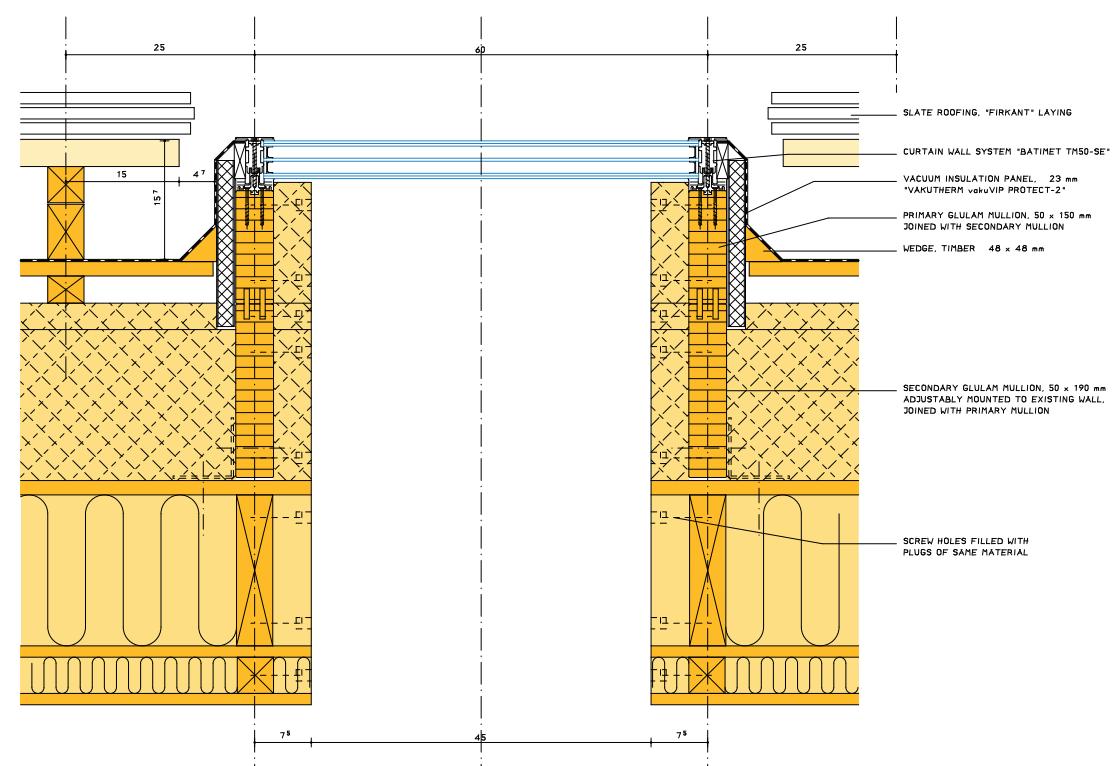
DETAIL EAVES - NORTH ROOF WITH SLATE ROOFING 1 : 5
